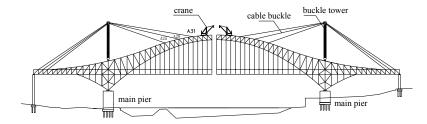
Layout for Arch and Steel Truss Closure at Mid-Span Simultaneously
